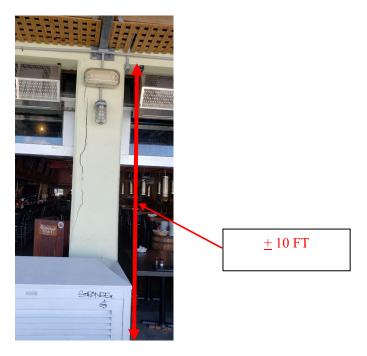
Location 26: Approximately 10 ft long new 16x12 concrete column. See detail 6/S104.
